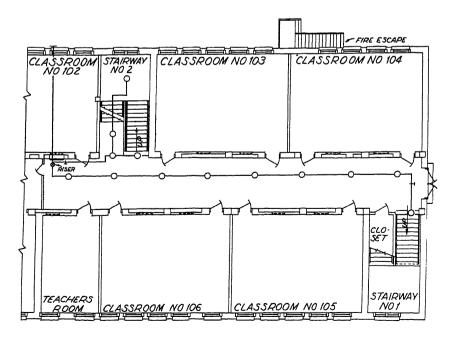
Floor plan of first floor showing location of automatic sprinklers.
